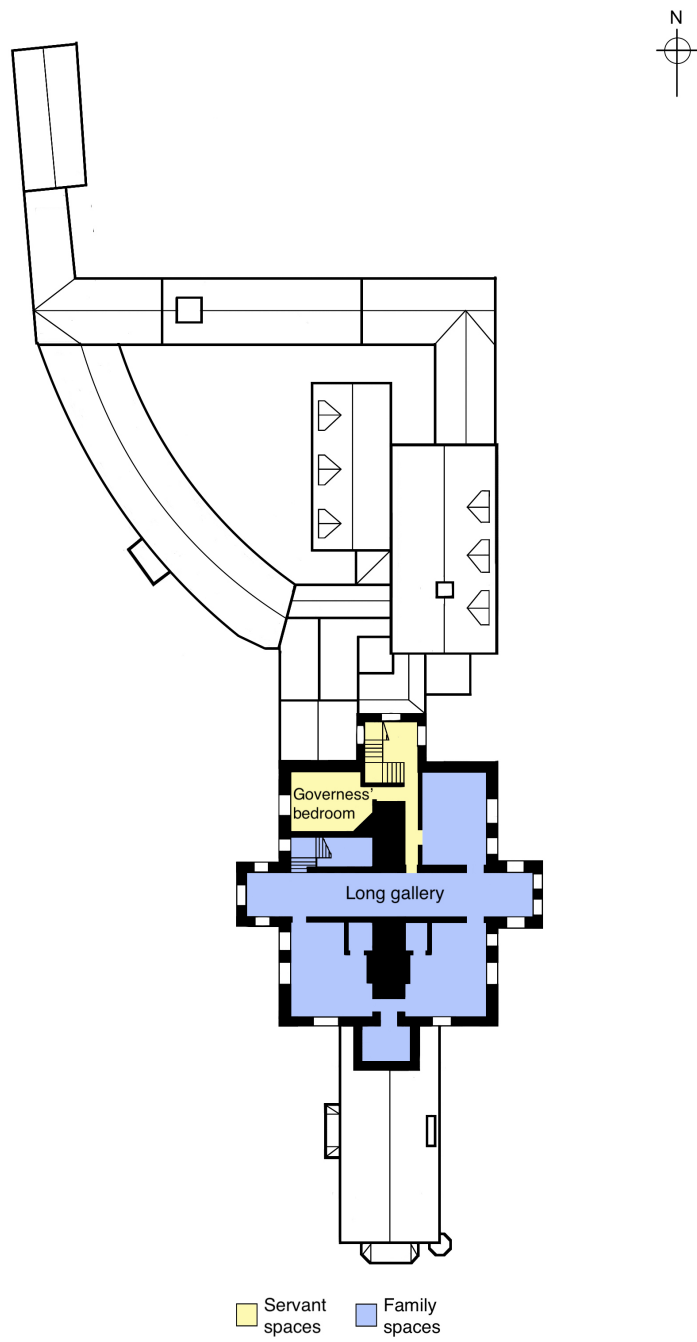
Kiplin Hall c1890 Phase 3 second floor plan
